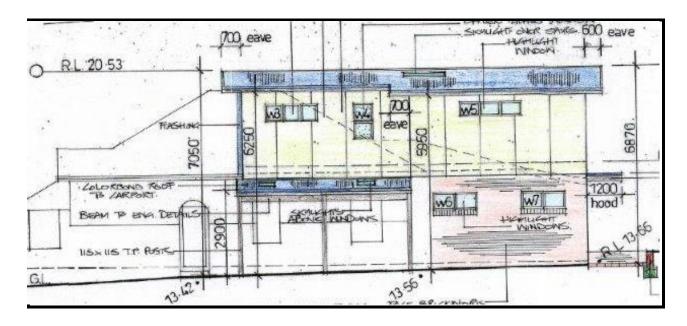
Proposed Southern Elevation (Source: Peter Banfield, 3 July 2017)
